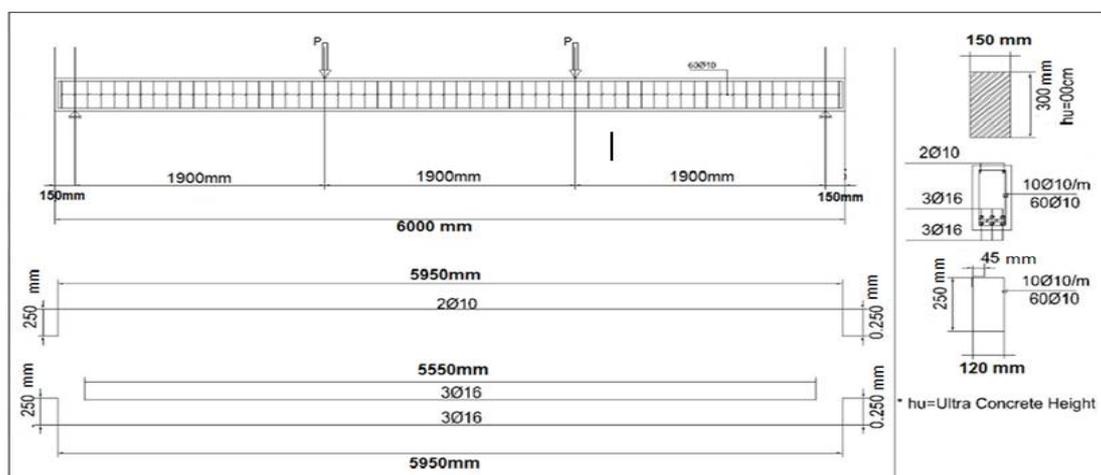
The concrete dimensions and steel reinforcement details of specimen B1
